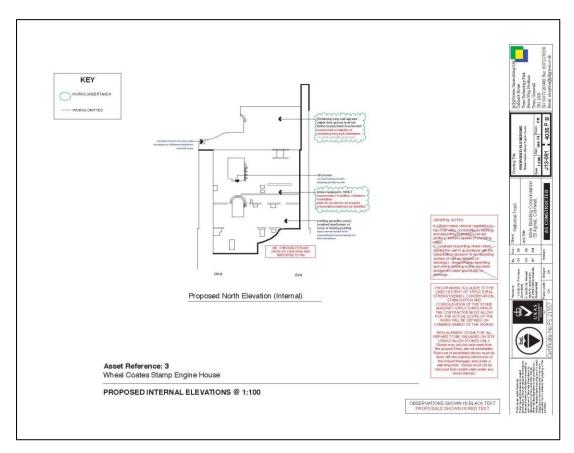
Northern internal elevation of Wheal Coates stamps engine house.
